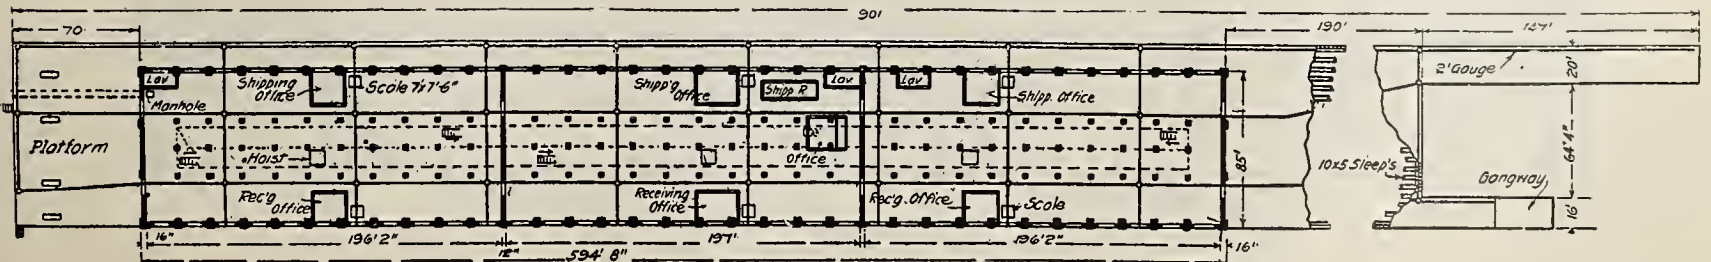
FLOOR PLAN OF STORE HOUSE C. P. R. SHOPS.
